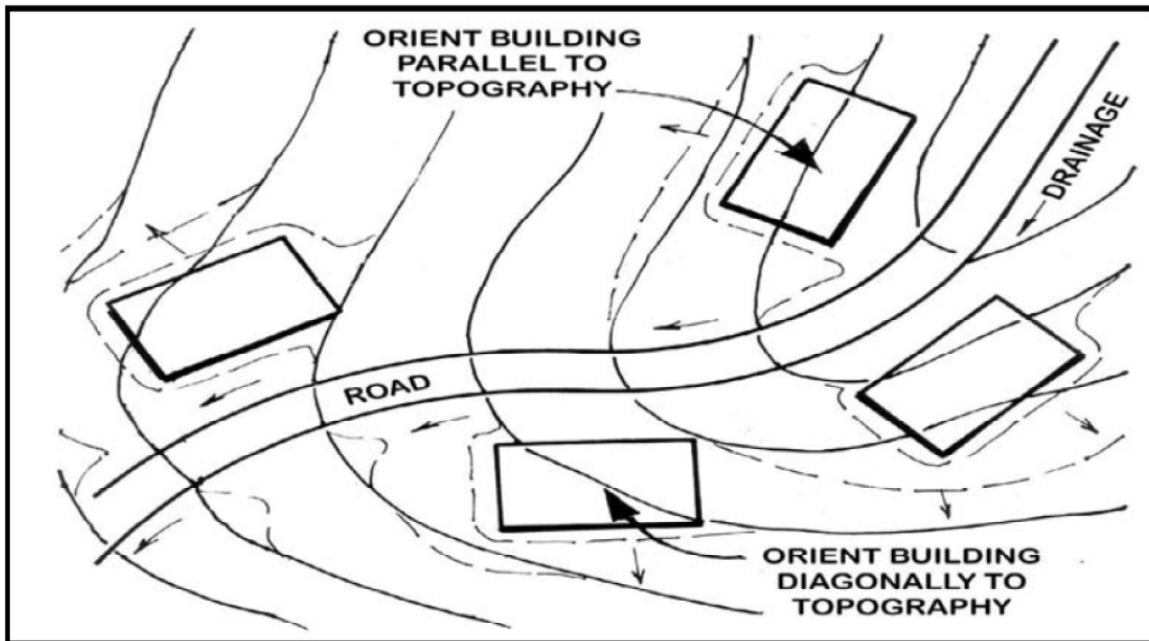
Site Concept Plan Using Existing Natural Conditions
